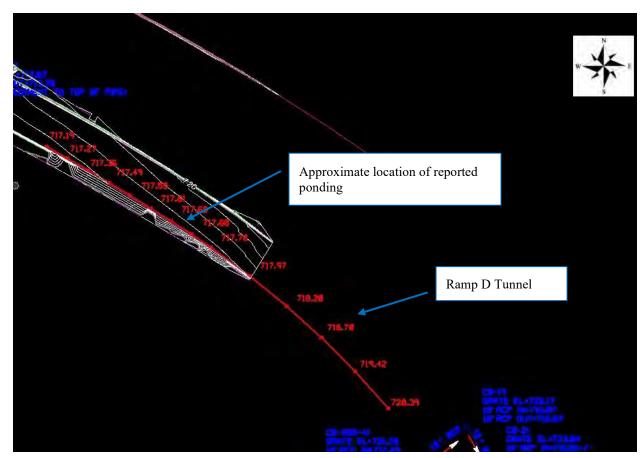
Spot Elevations Along Ramp D and the Ramp D Tunnel
